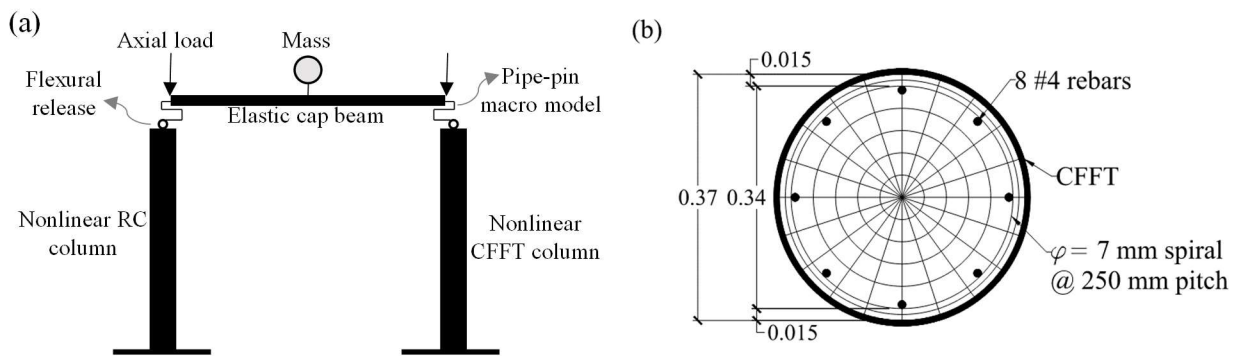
Structural model of the two-column bridge pier (units in m): (a) finite element model of the bridge pier; and (b) fiber discretization of the CFFT column cross-section
